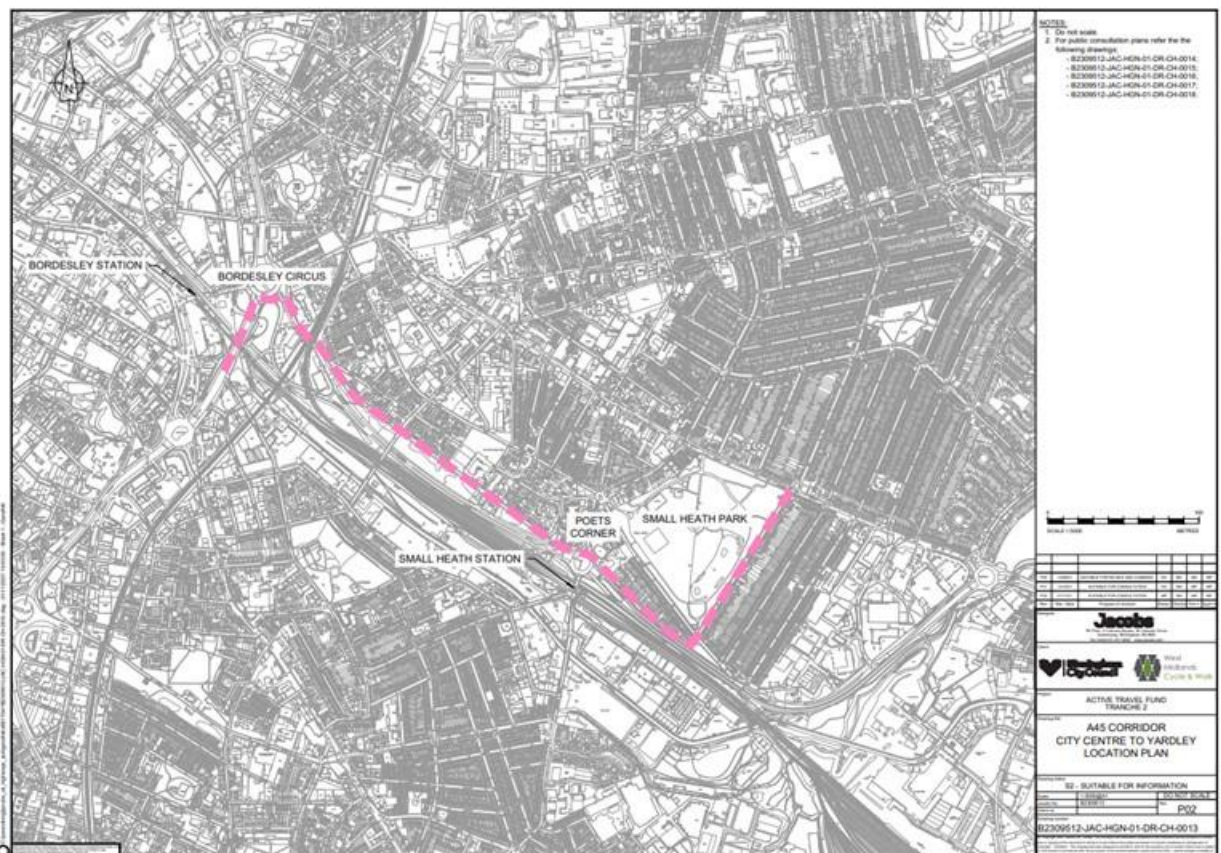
A45, city centre to Small Heath Park proposals (overview plan)
